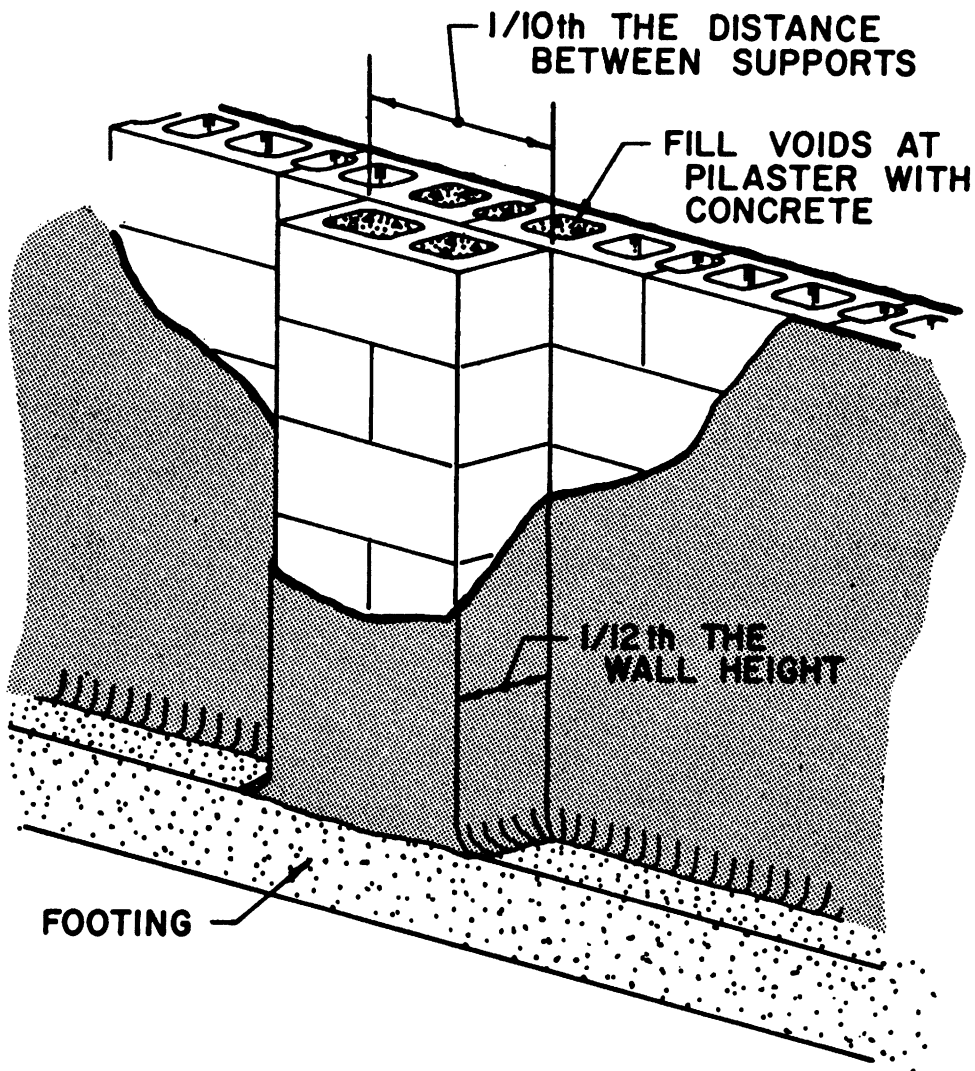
A typical pilaster for strengthening a wall or supporting a beam.
